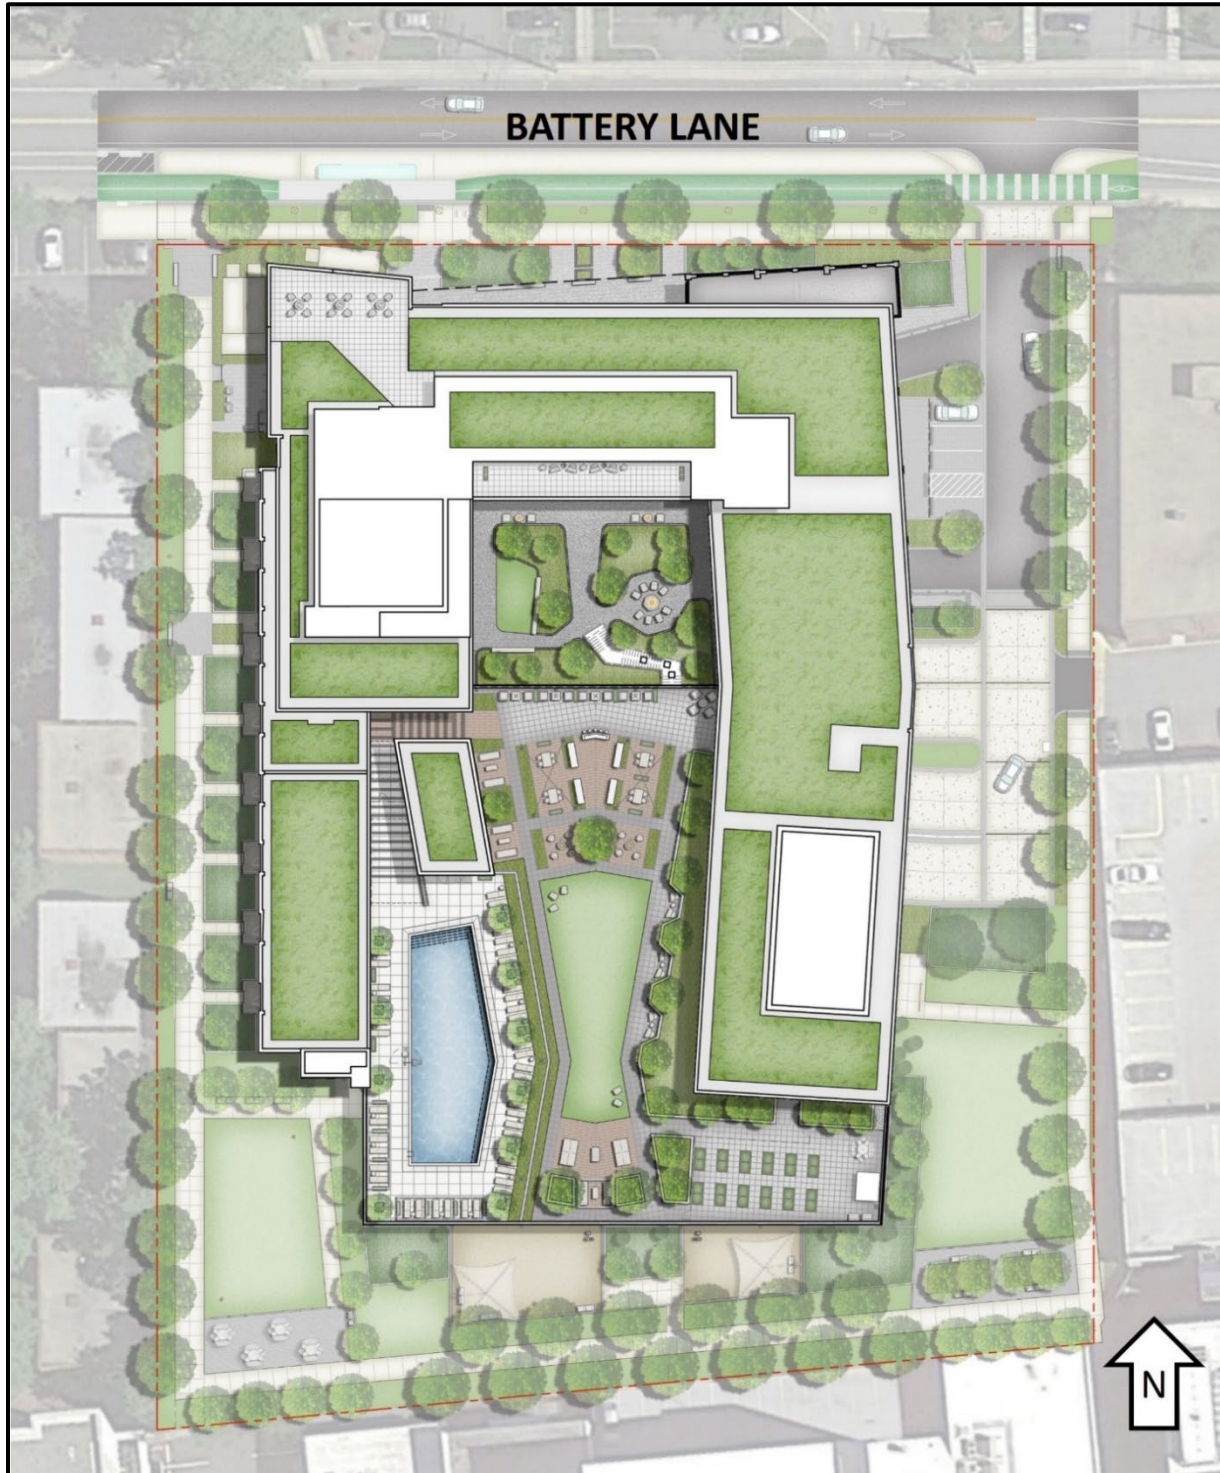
Illustrative Rendering Site Plan No. 820220230
